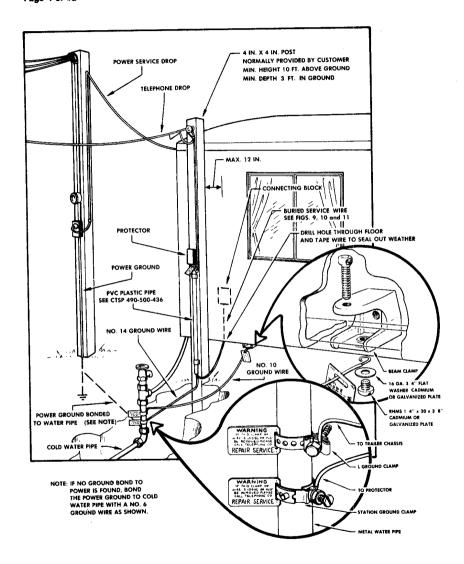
Typical Installation—Aerial Distribution Water Pipe Ground
